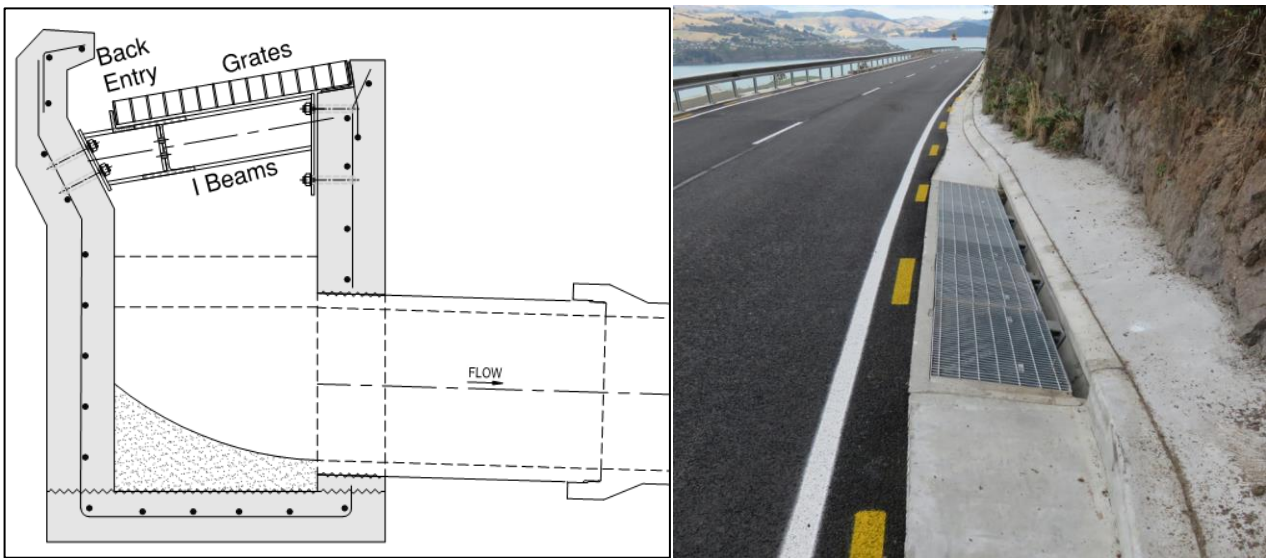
Pipe Inlet Structure Section (at deeper section) and Photo
